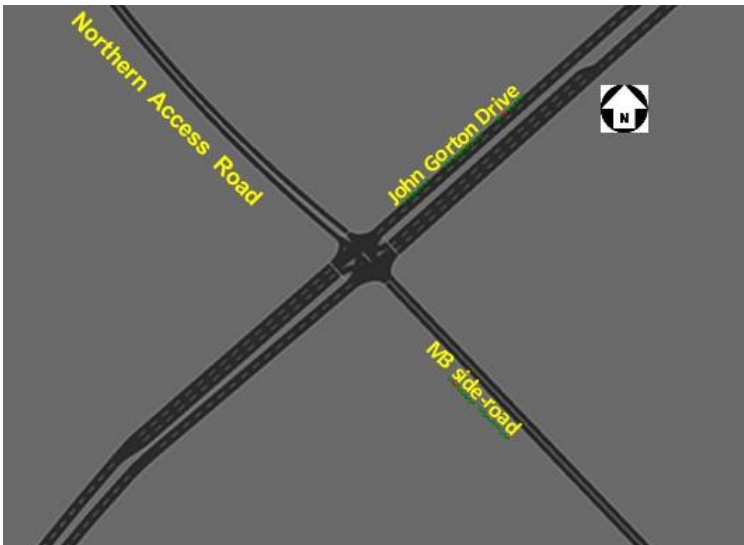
Initial signalled layout for John Gorton Drive intersections with Northern Access Road
